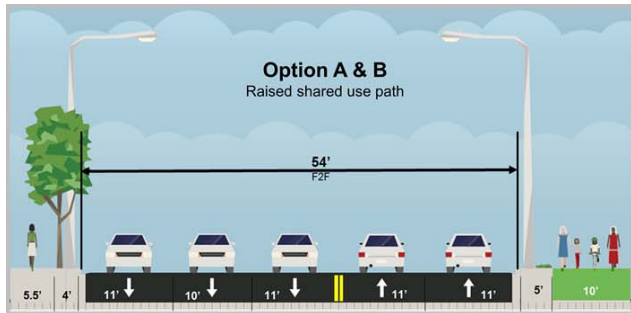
Example typical section on Broom Street, providing raised shared use path on east side.
